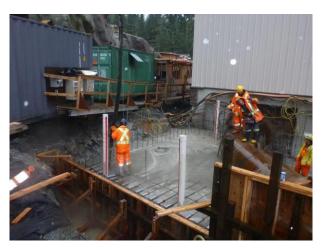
Concrete pour on the BDRHEF bifurcation (November 14, 2016).
